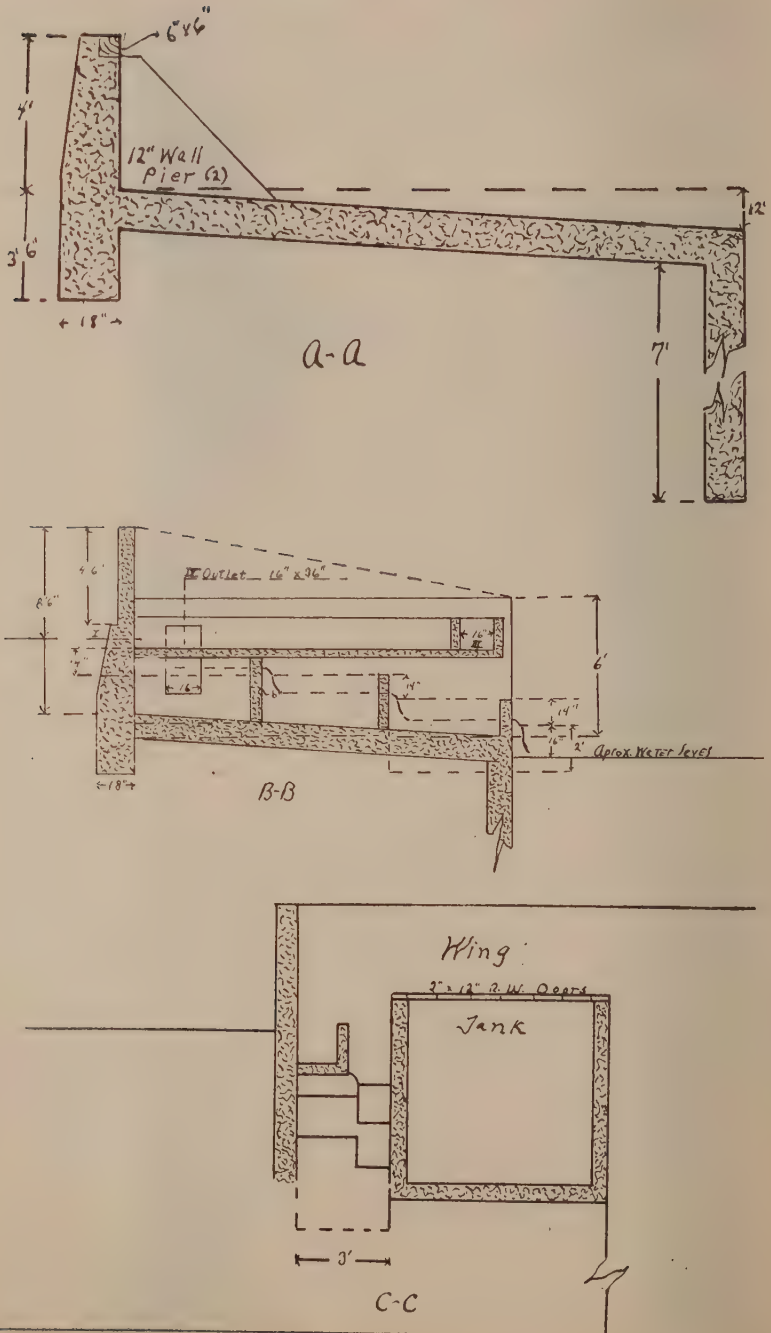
Sectional plans of the Waddell Creek trap and dam.
